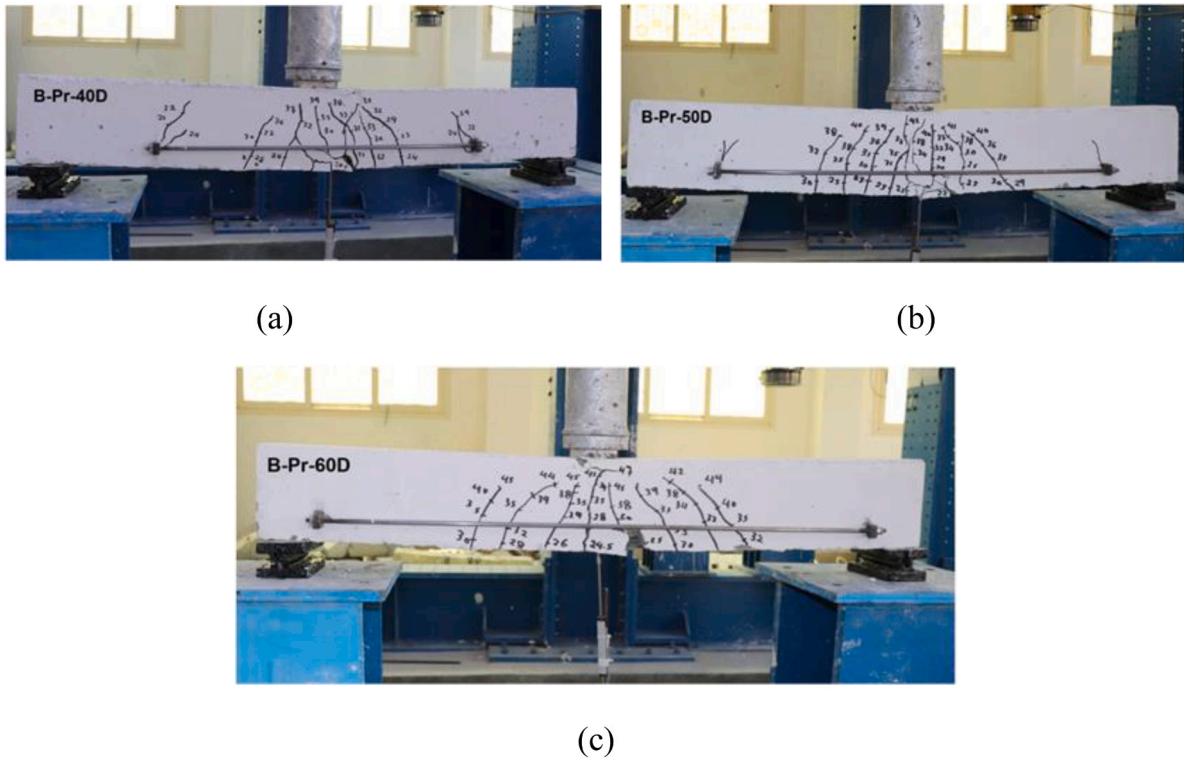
Failure modes of (a) Beam B-Pr-40D, (b) Beam B- Pr-50D, and (c) Beam B- Pr-60D.
